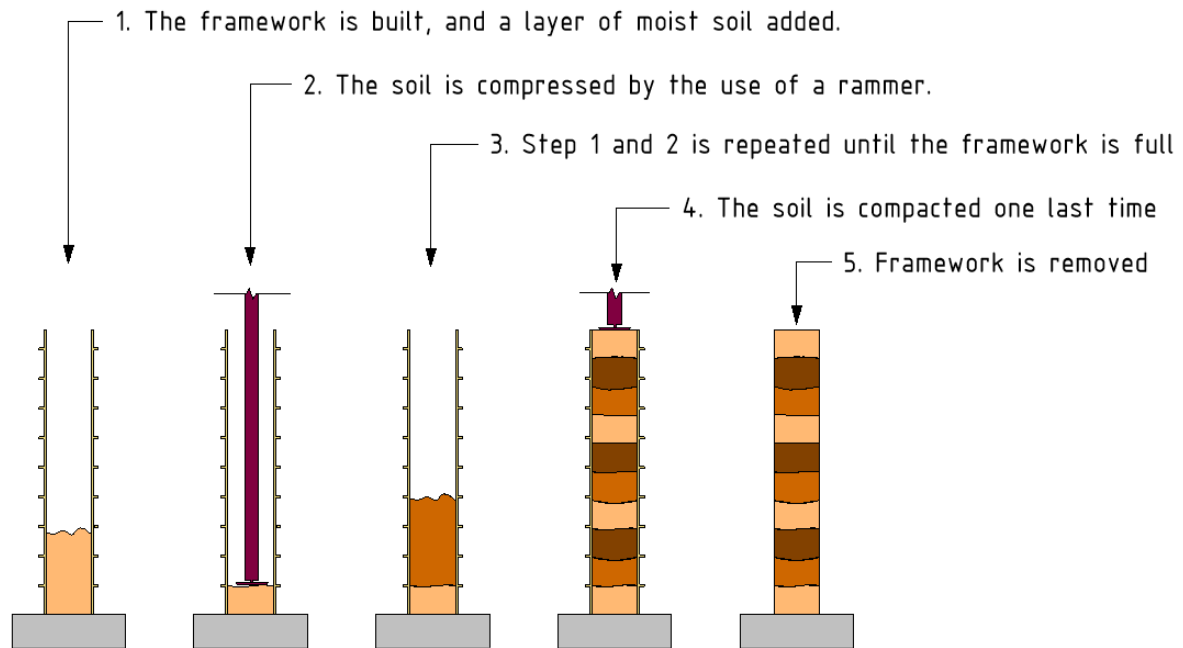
Construction of rammed earth wall. Figure based on ref [67]
